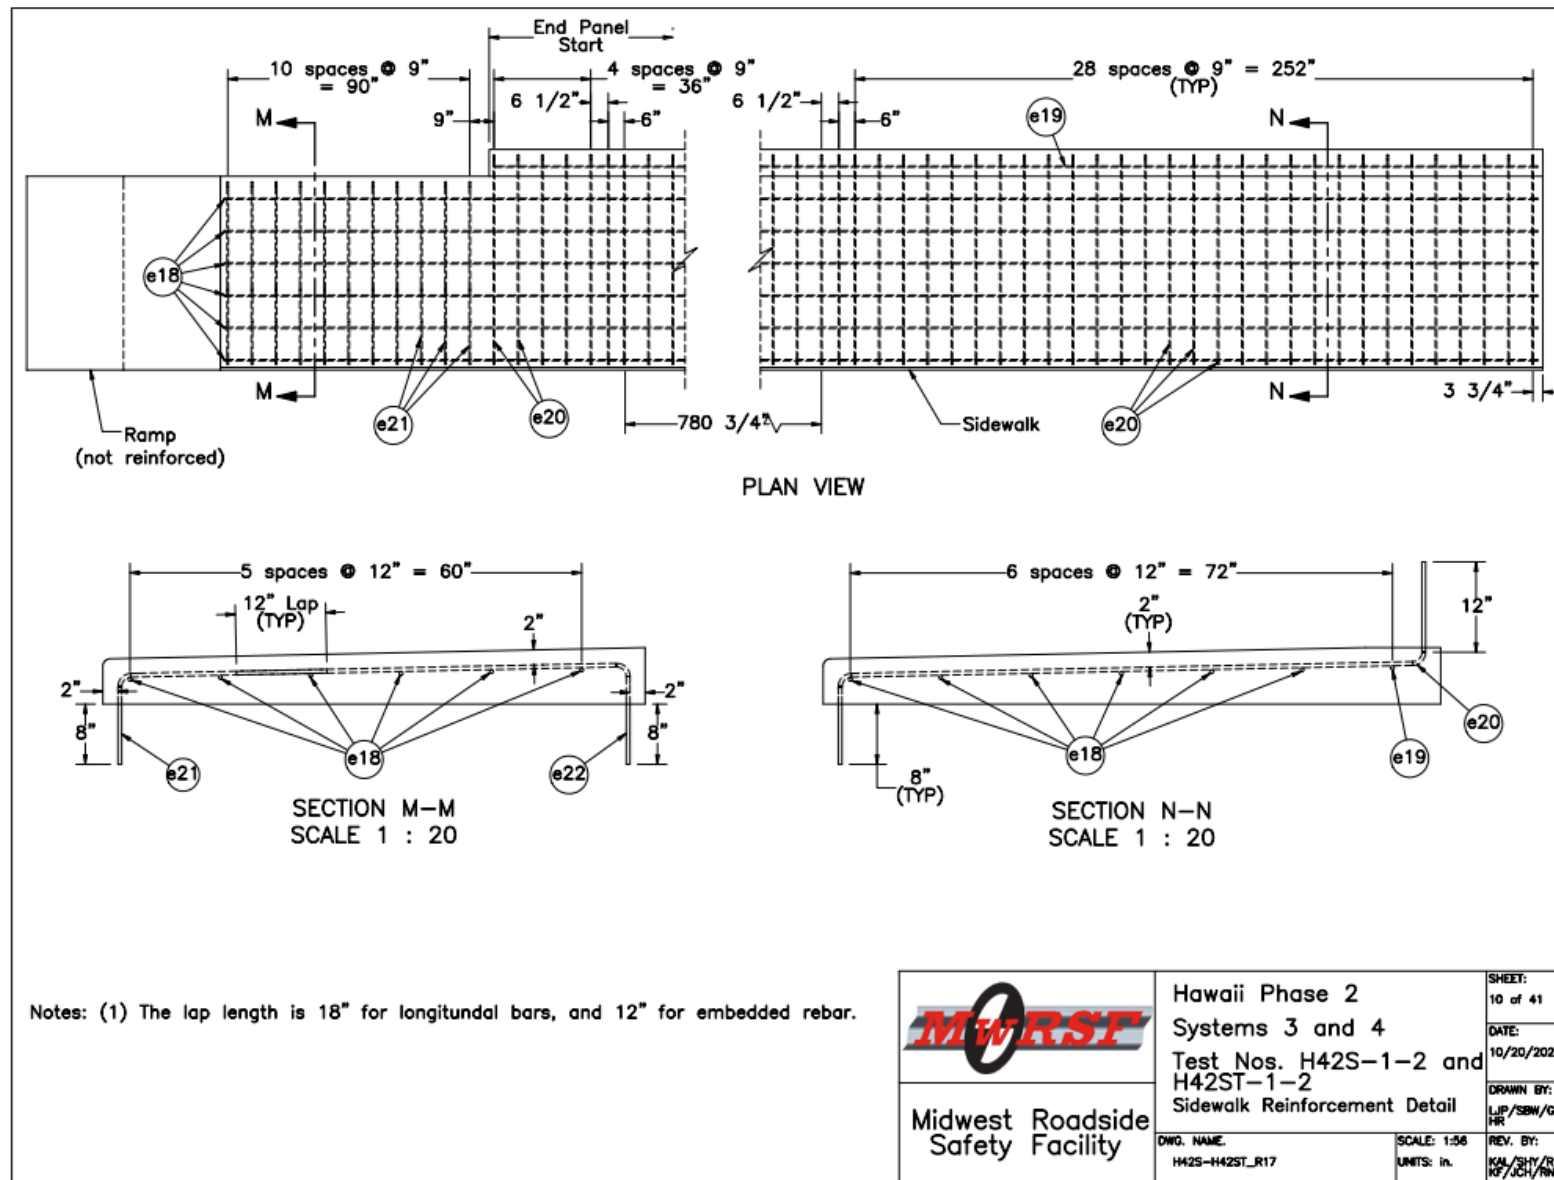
Sidewalk Reinforcement Detail, Test Nos. H42ST-1 and H42ST-2
